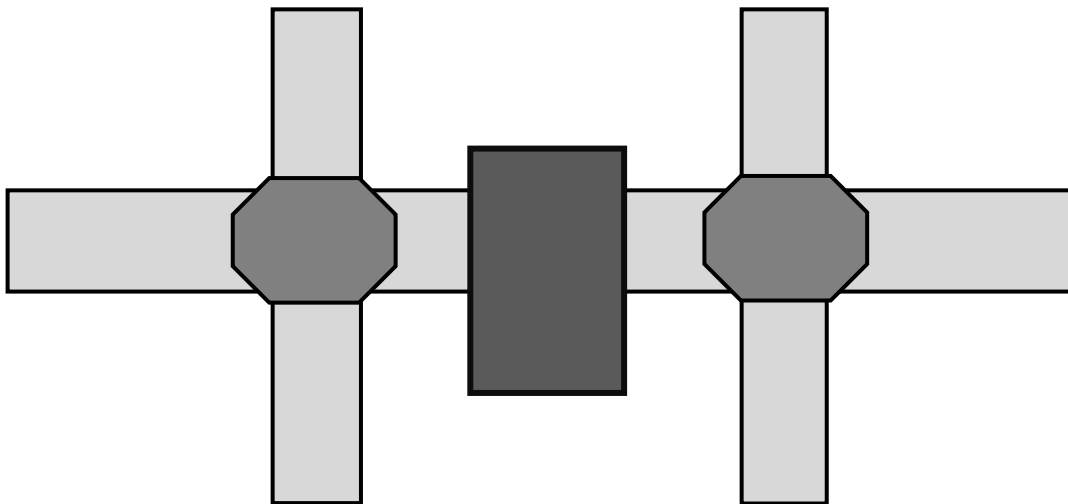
Stanley Royd Lunatic Asylum c. 1818, floor plan – not to scale
